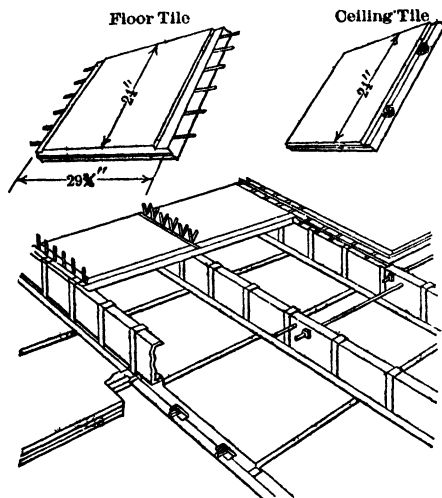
"Gypsteel" Pre-cast Floor-construction, Showing Floor- and Ceiling-slabs and Hangers
